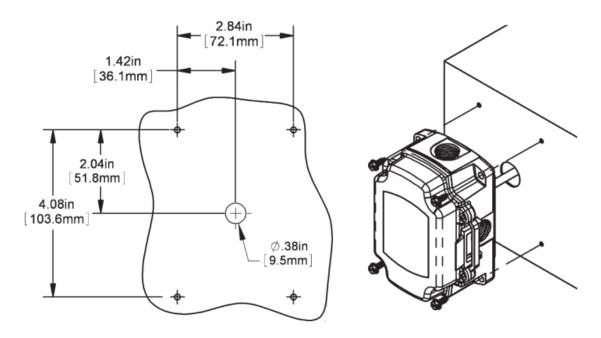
Enclosure Mounting Holes, Rotate 90° for Horizontal Mounting
